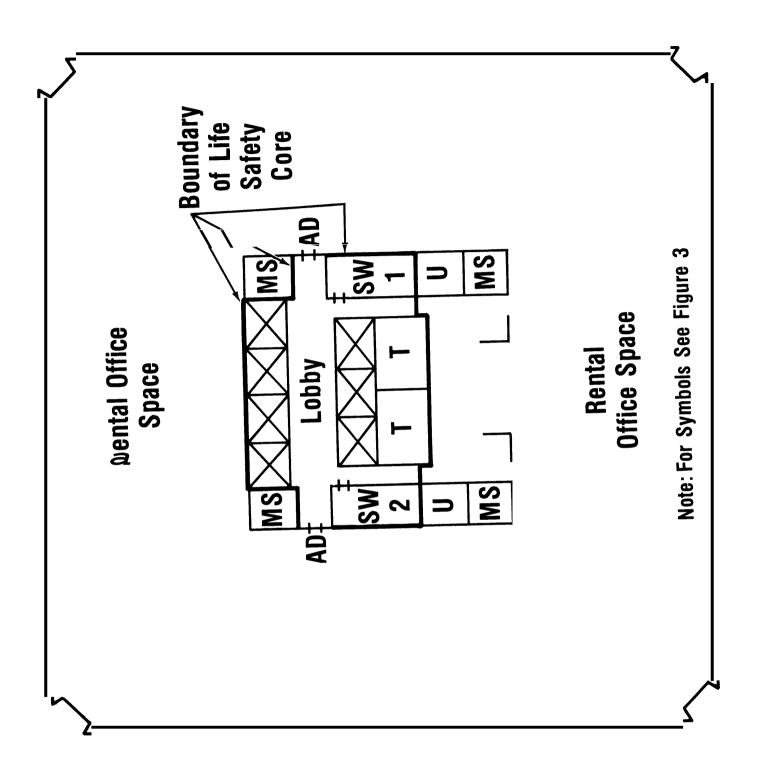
Typical Floor Plan for Floors 20 through 36 of Building 5
